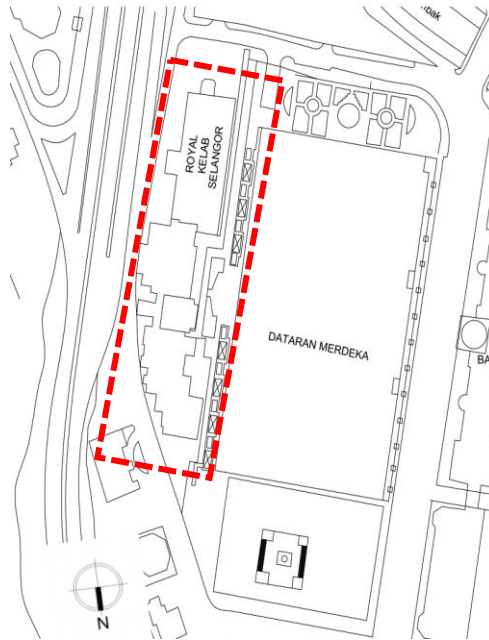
(a) : Site Plan with Site boundary (Pau, 2017)
